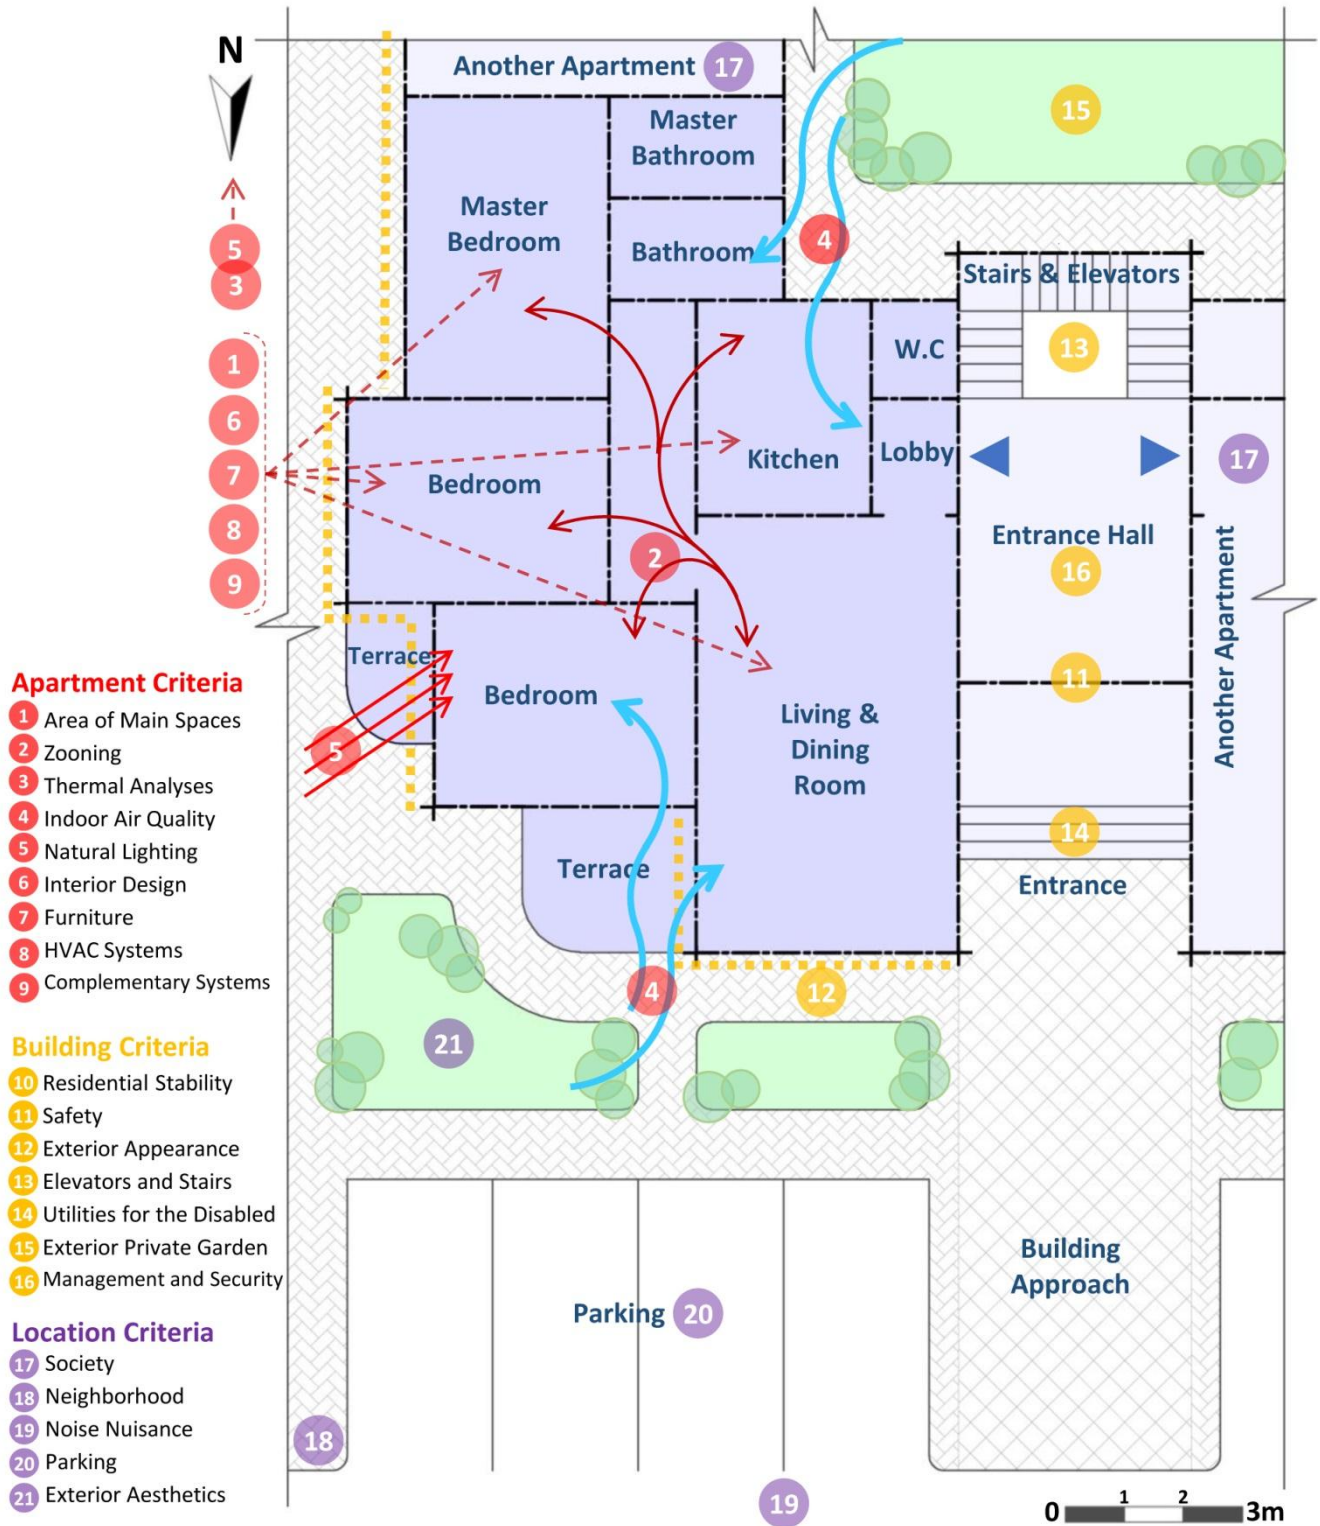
Positions where the complied criteria are effective in an apartment plan and layout
